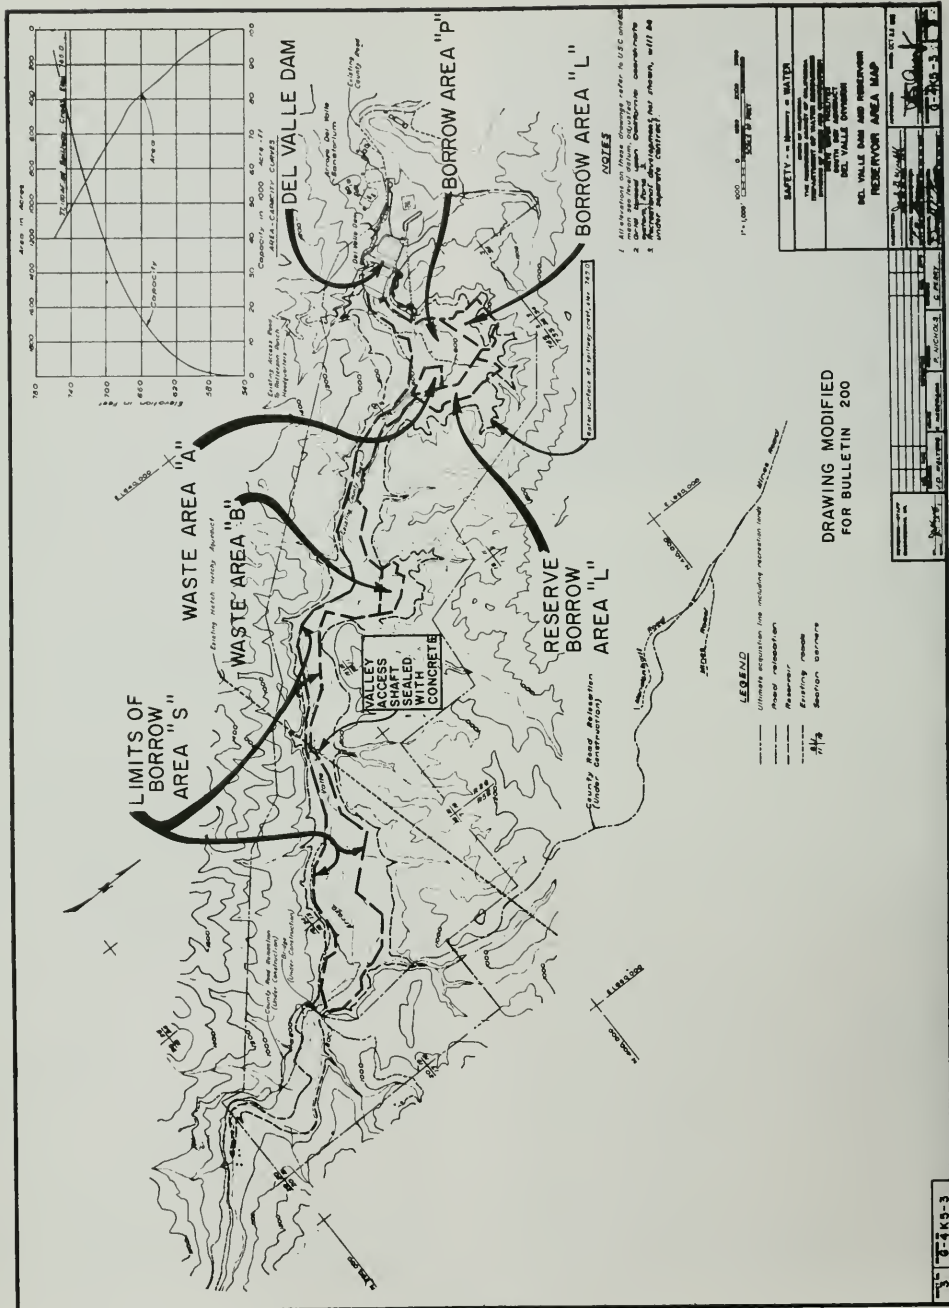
Location of Borrow Areas and Del Valle Dam Site
